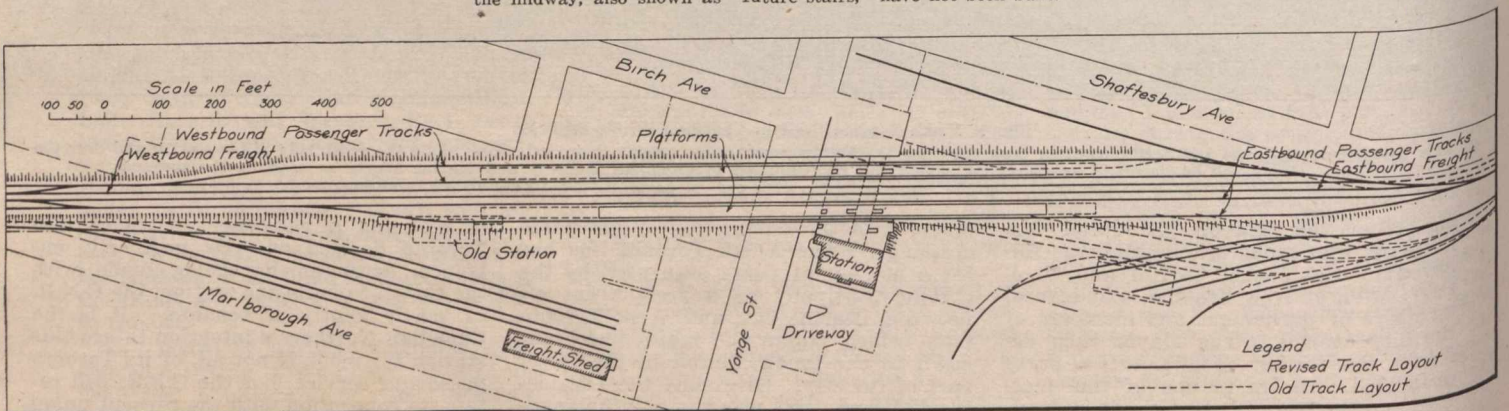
Track Arrangement, North Toronto Station, Canadian Pacific Railway.
